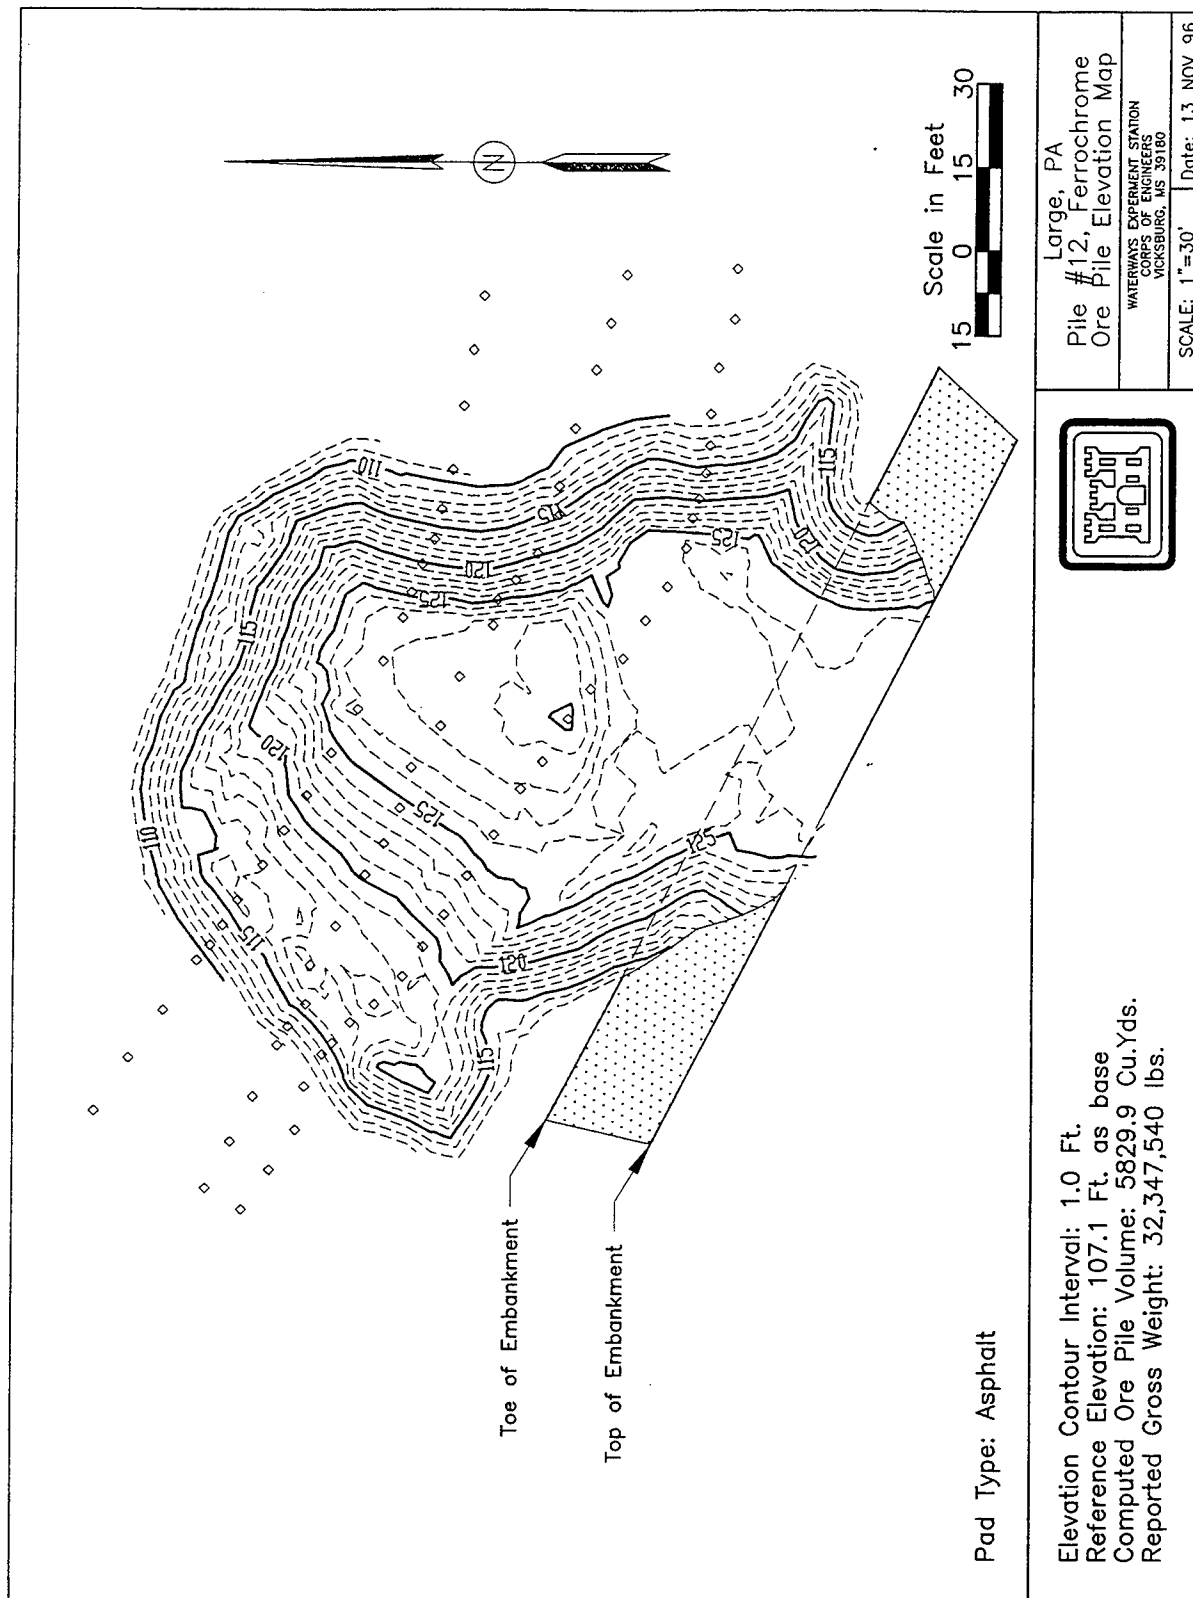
Elevation contour plot of Pile #12, Large, PA
